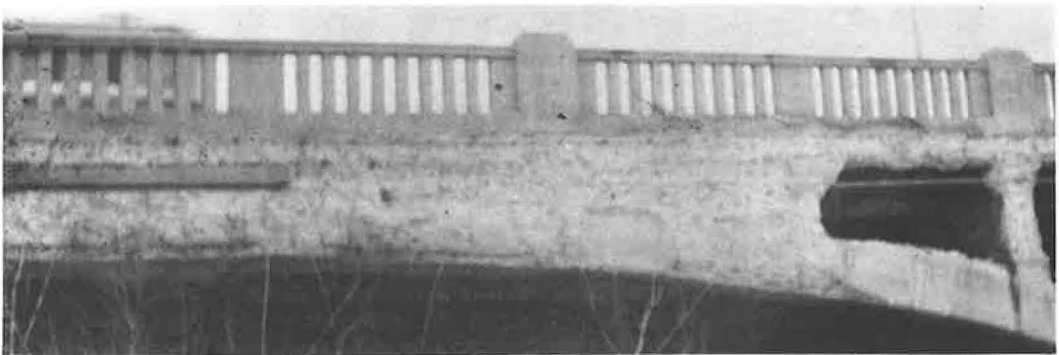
Spalled arch ribs before repair, 112th St. Bridge, Troy.
